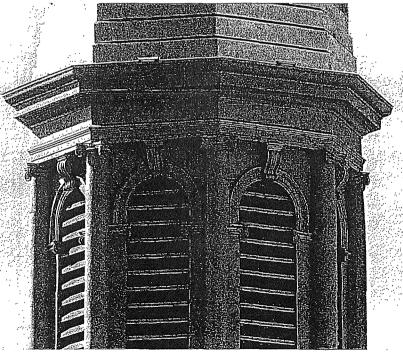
East tower detail after restoration (Rich Stapleton, 05/21/2018).
